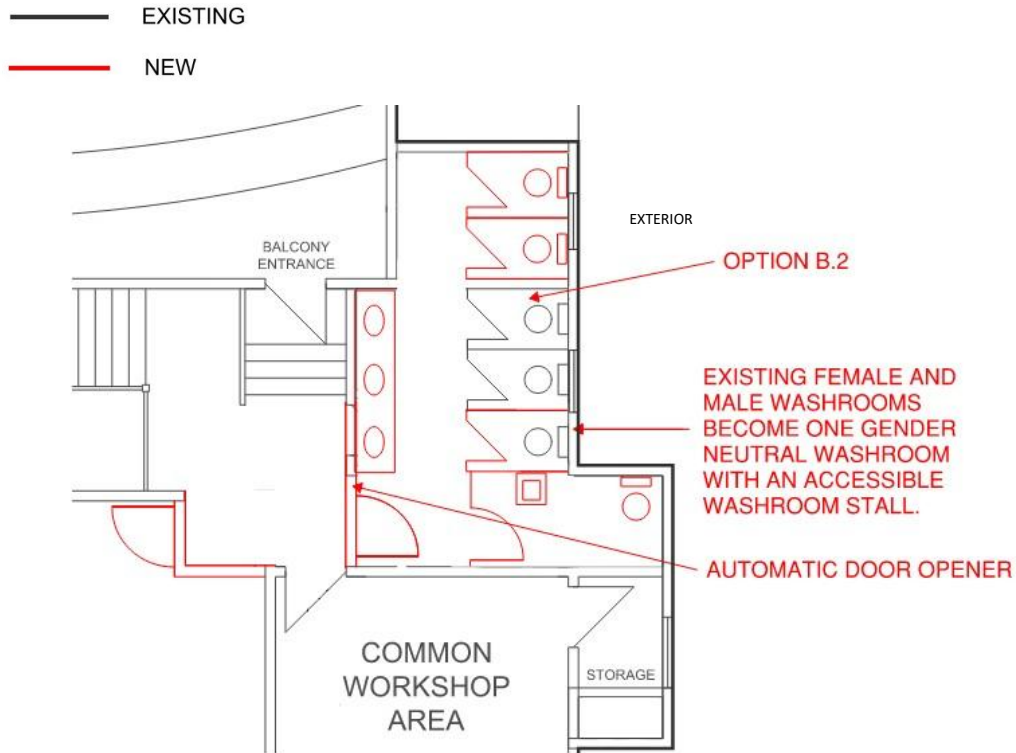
Option B.2: Second floor gender-neutral washroom with an accessible stall
